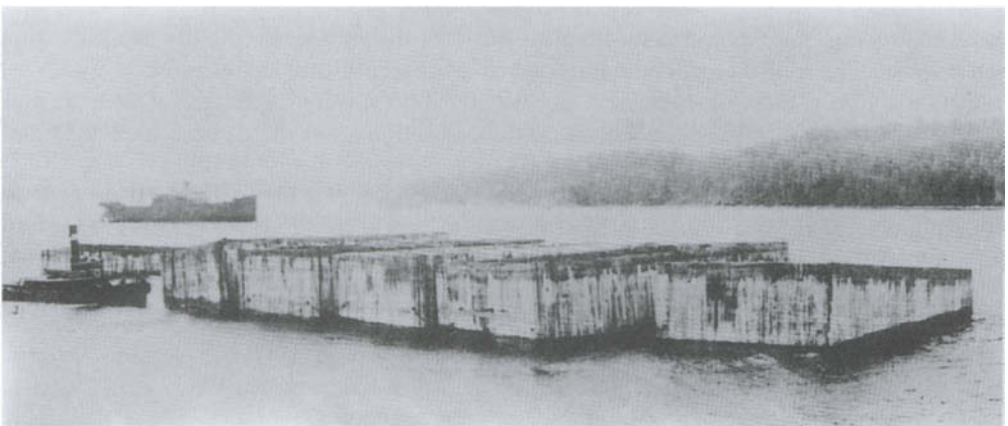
CAC concrete cribs used in the construction of a pier at Halifax, Canada in 1930.
